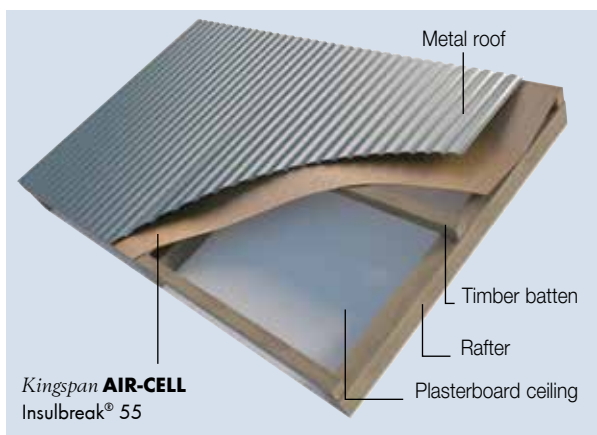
Kingspan AIR-CELL Insulbreak® 55* in a metal roof with a raked ceiling
